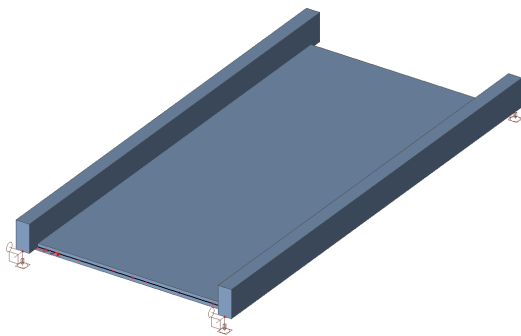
SCIA model for a floor plate supported on flexible side girders
